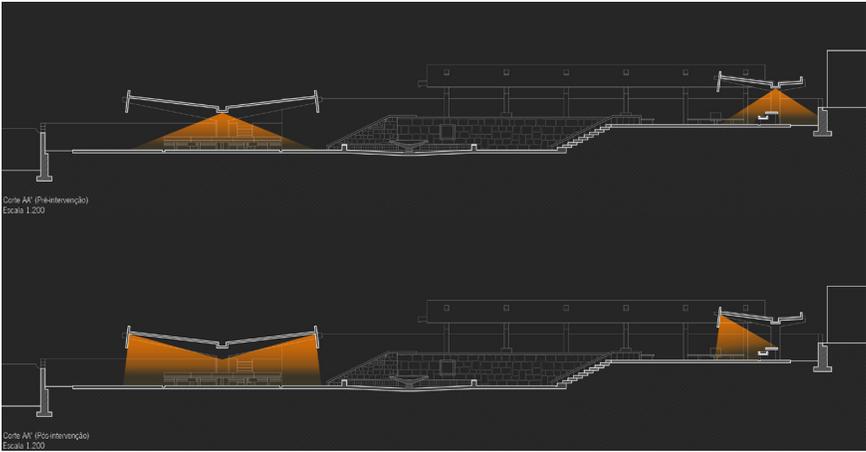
Market's original lighting layout (as of 1955's plan) restoration scheme -above- and -below- new proposed perimeter lighting (drawings by Marco António da Silva Vieira).
